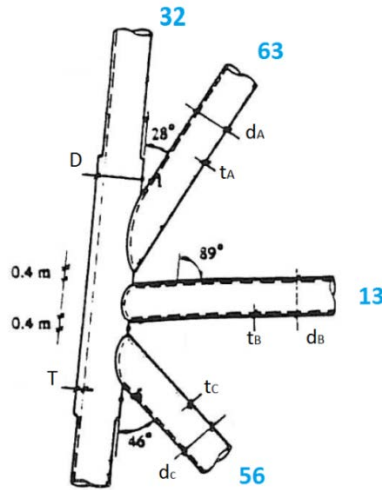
Detail view of tubular joint 9 in ZX-plane ref.[2]
